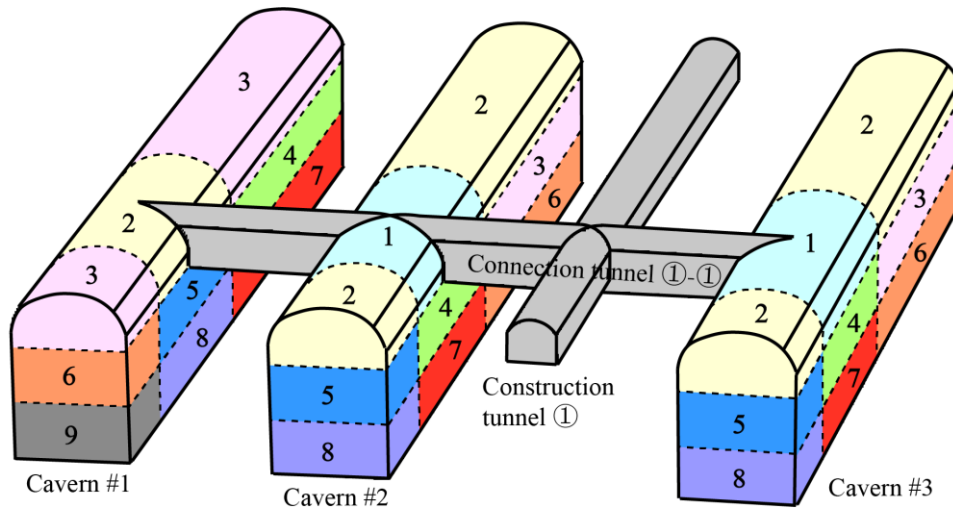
Excavation sequence of intersection between storage caverns and connection tunnel
